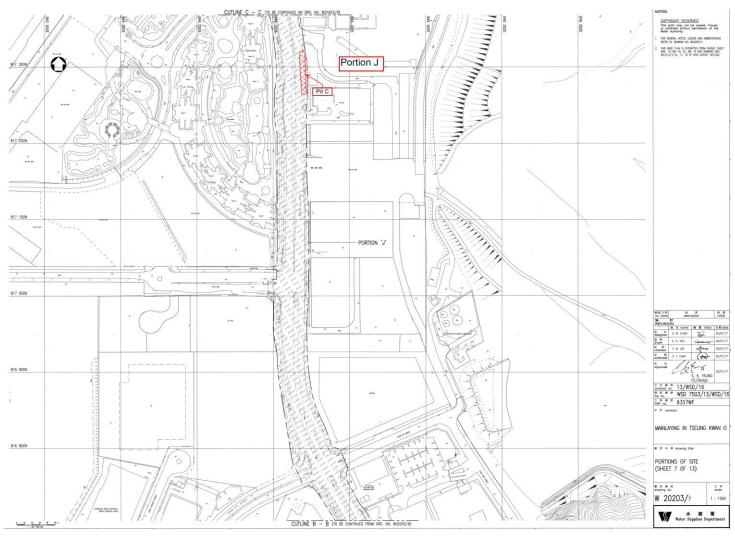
Location Plan for Portion J – CH.A 19+15 to CH.A 19+50 (Pit C)
